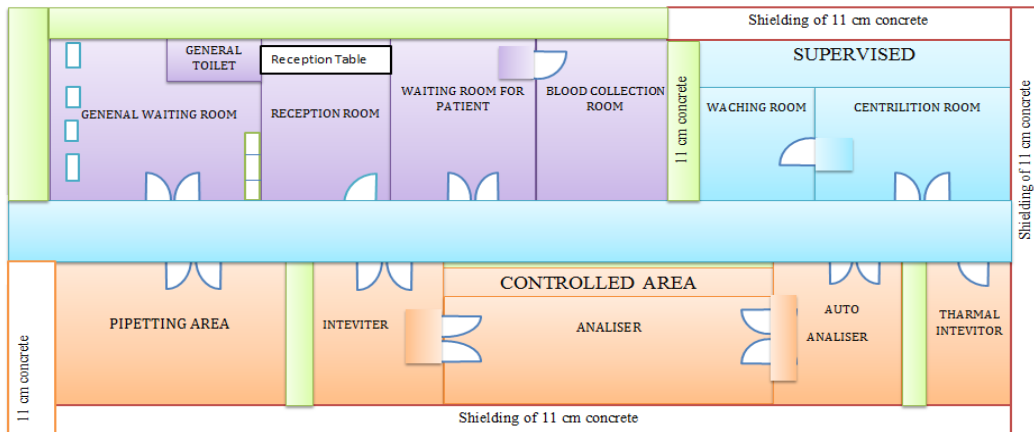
A typical layout for In-Vitro lab of nuclear medicine center with 11 cm concrete walls because the maximum radiation safety is being considered, total area = 150-160 sq.m.
